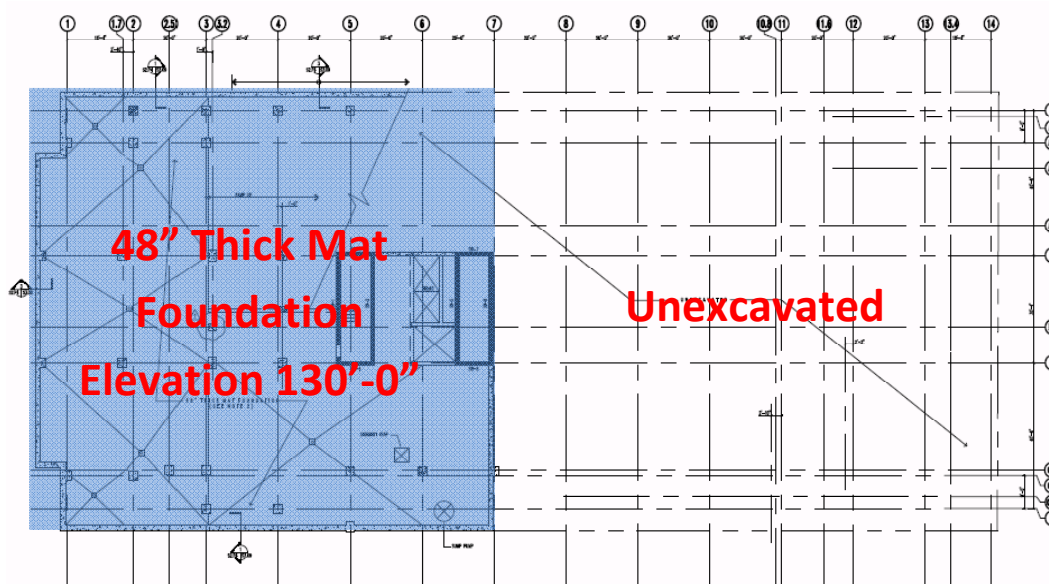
4th Level of Parking Garage with General Mat Foundation Location
